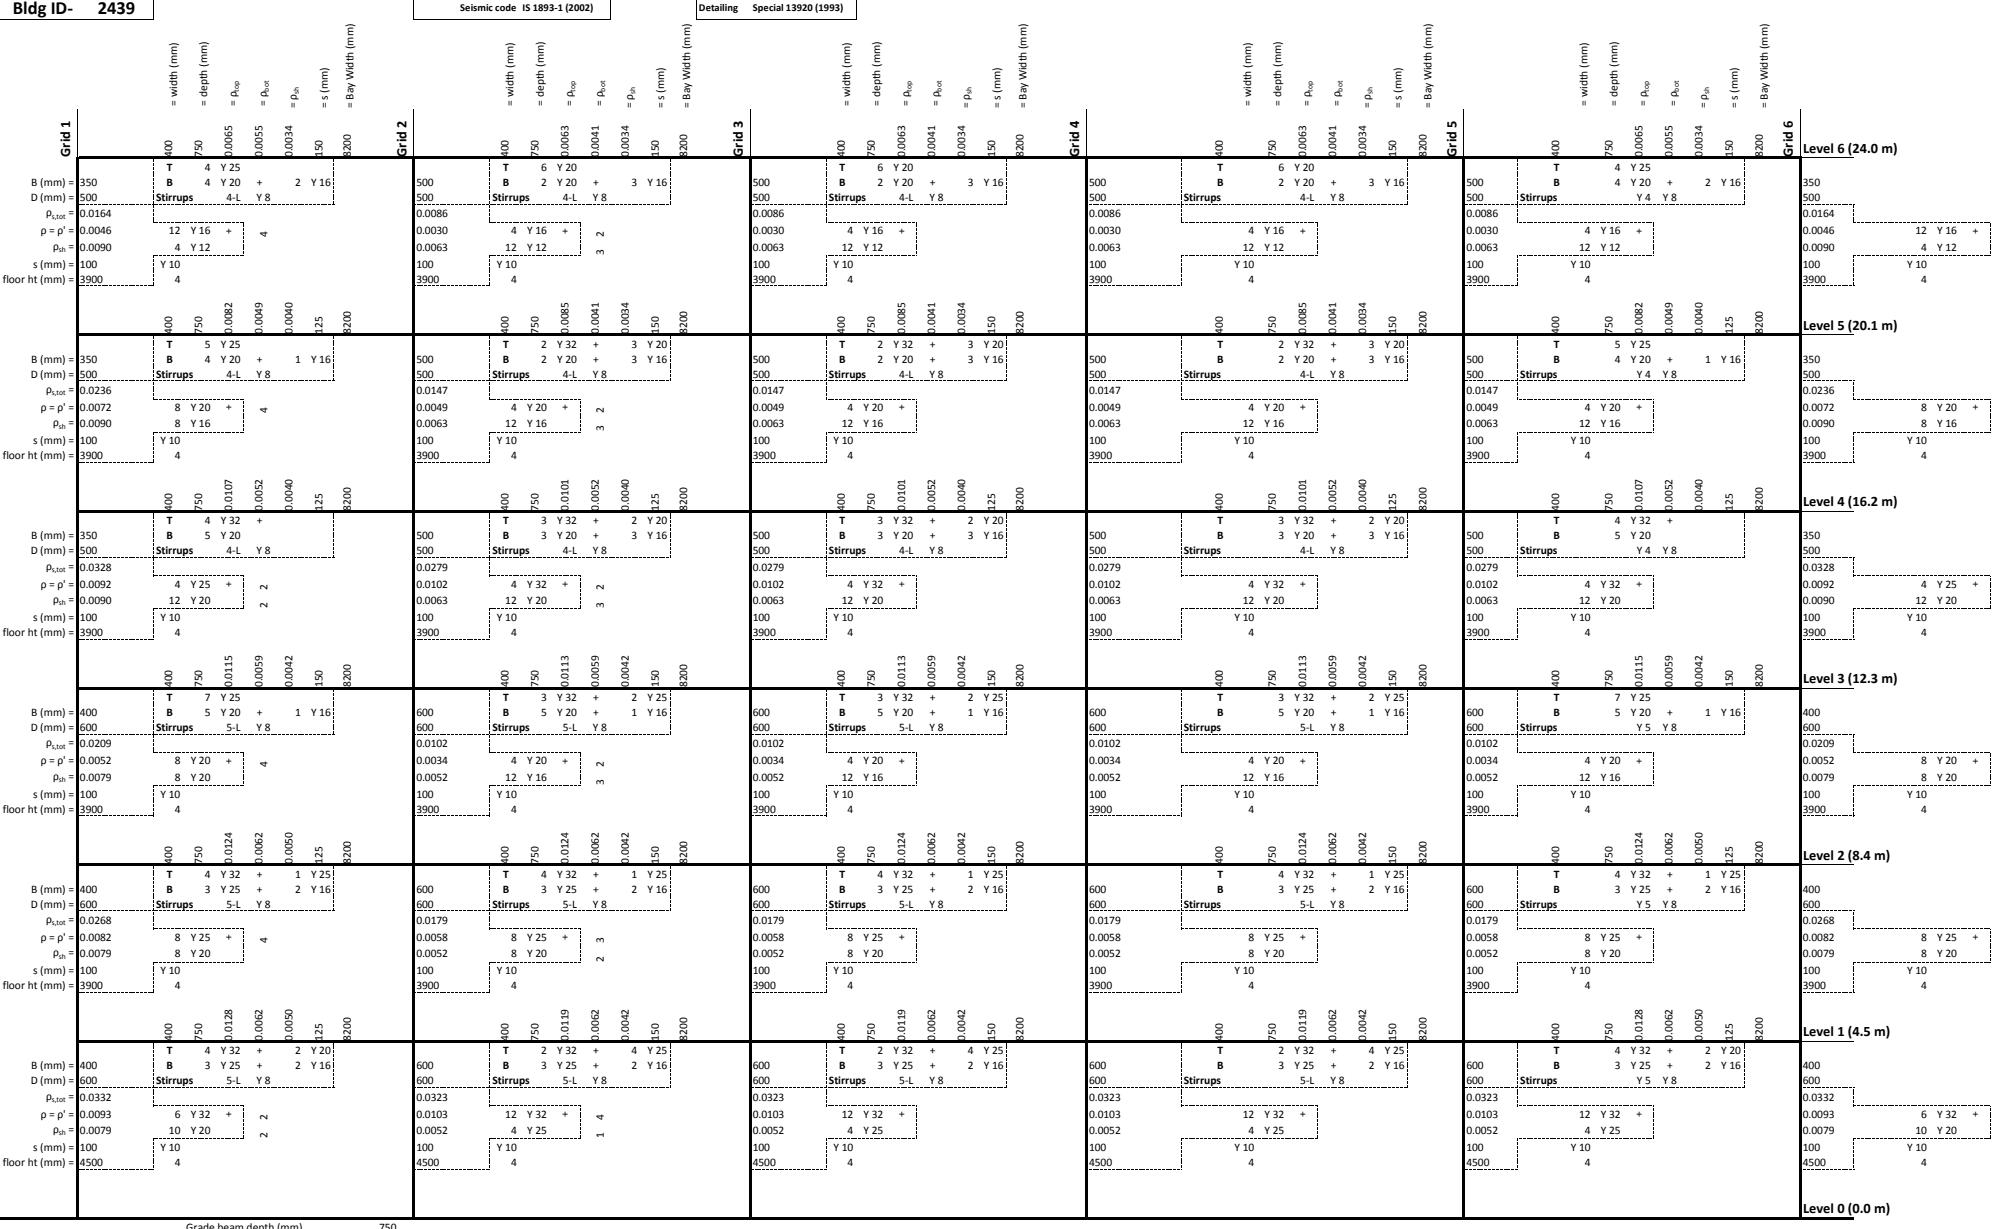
Provided reinforcement and modeling details for building ID 2439
